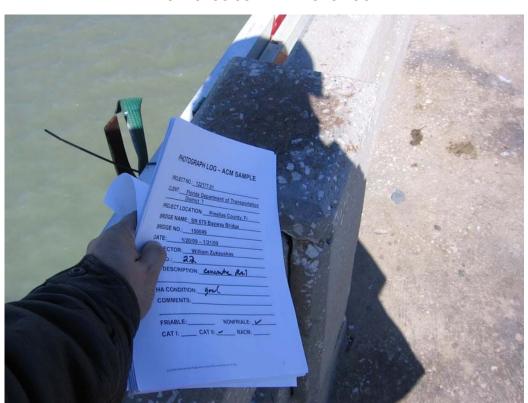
01/21/09 - SAMPLE 2.2 - HA 2 CONCRETE RAILS AND BEAMS
